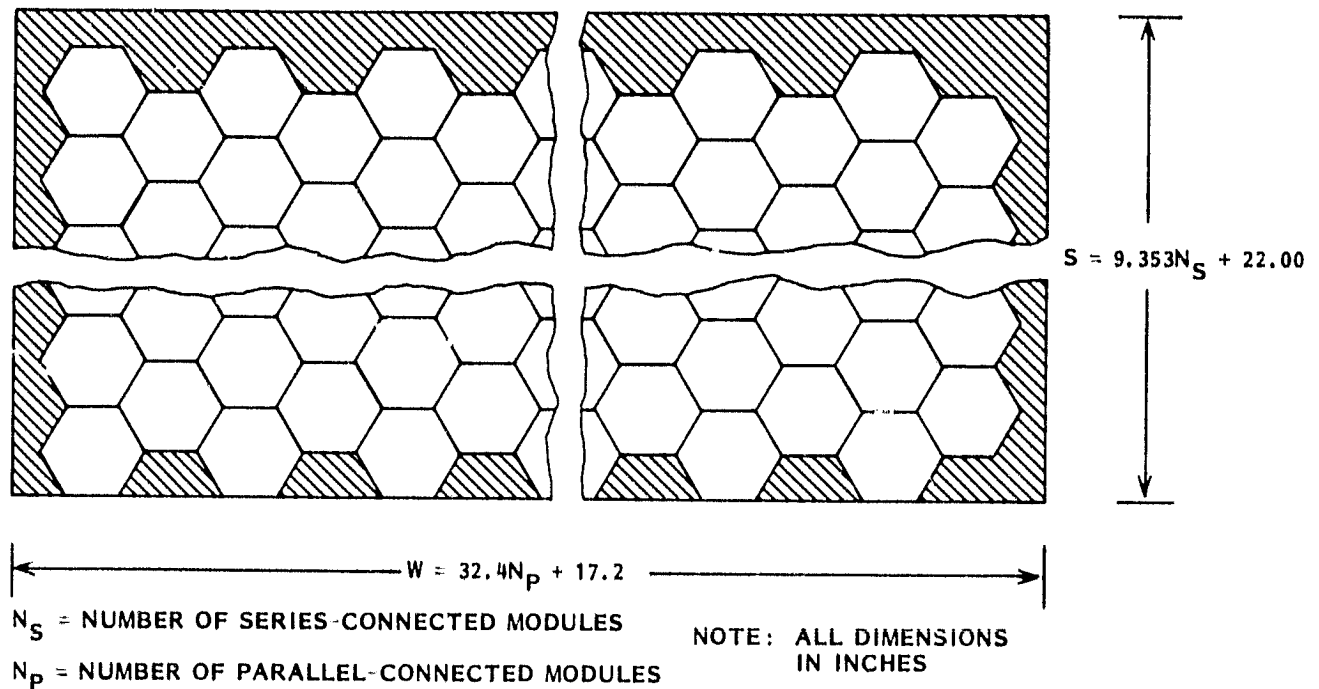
Shingle Module Arrangement on a Rectangular Roof Surface
